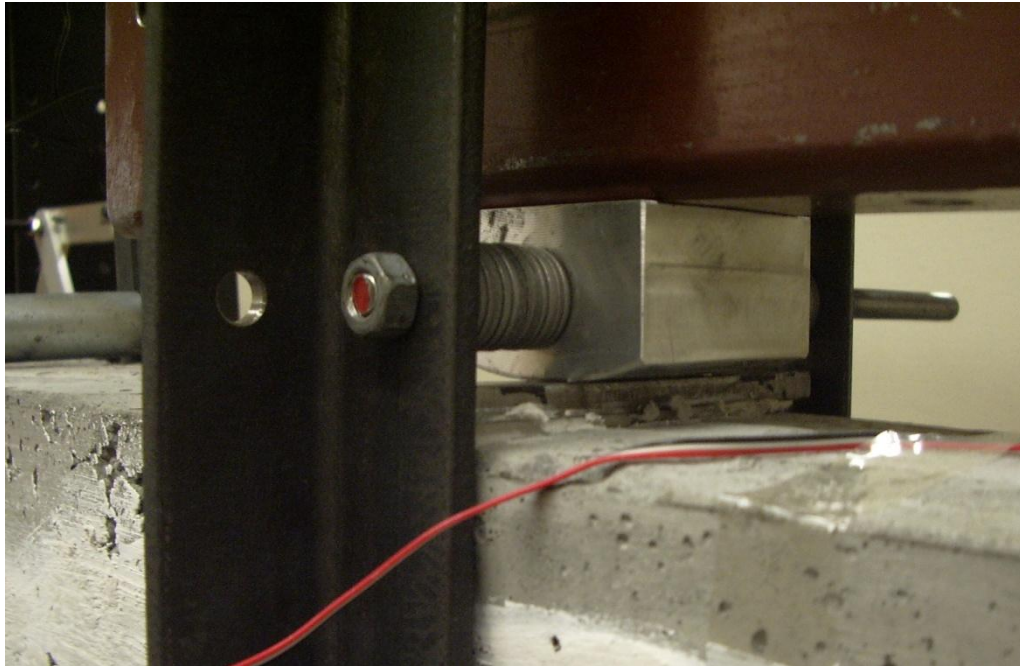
Bearing strip in bed of gypsum plaster under loading pin
